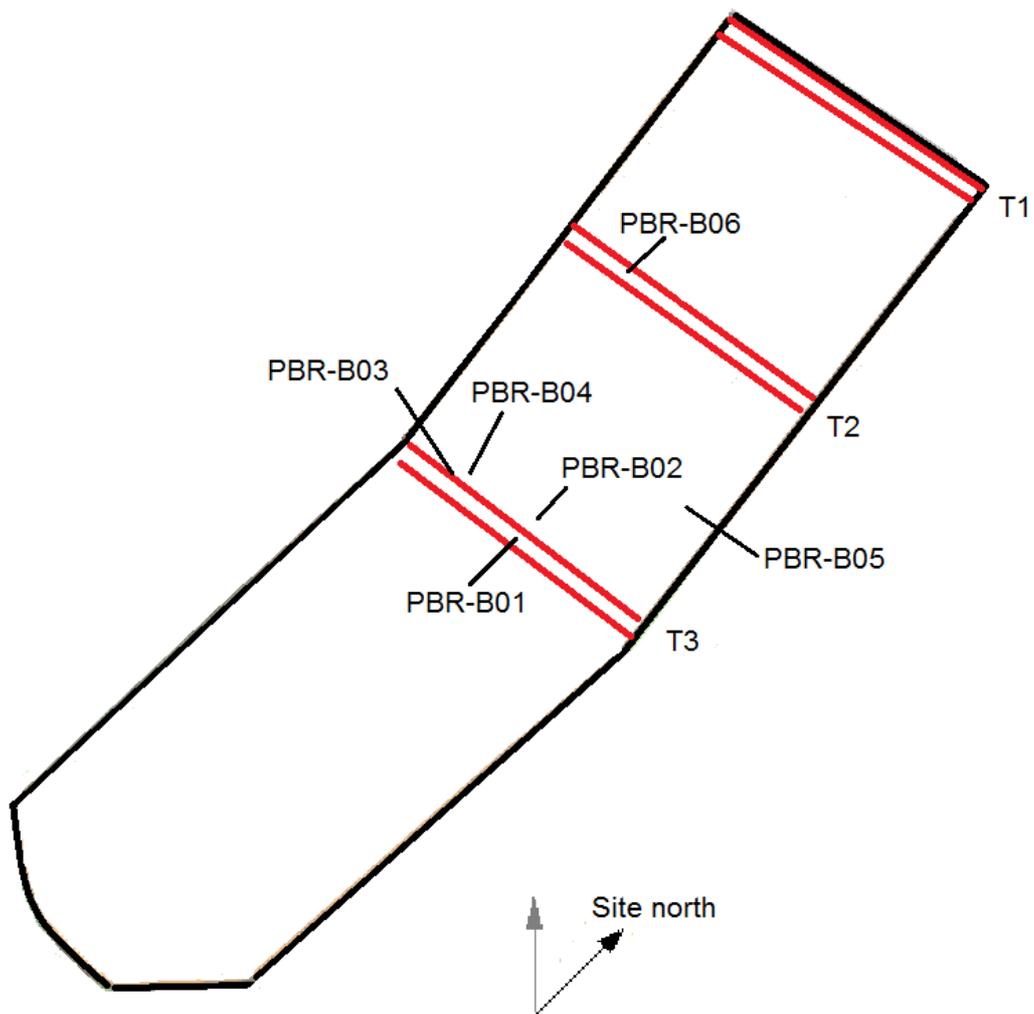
11-13 Cornmarket, sketch plan, showing the approximate position of trusses and the location of samples PBR-B01–06
